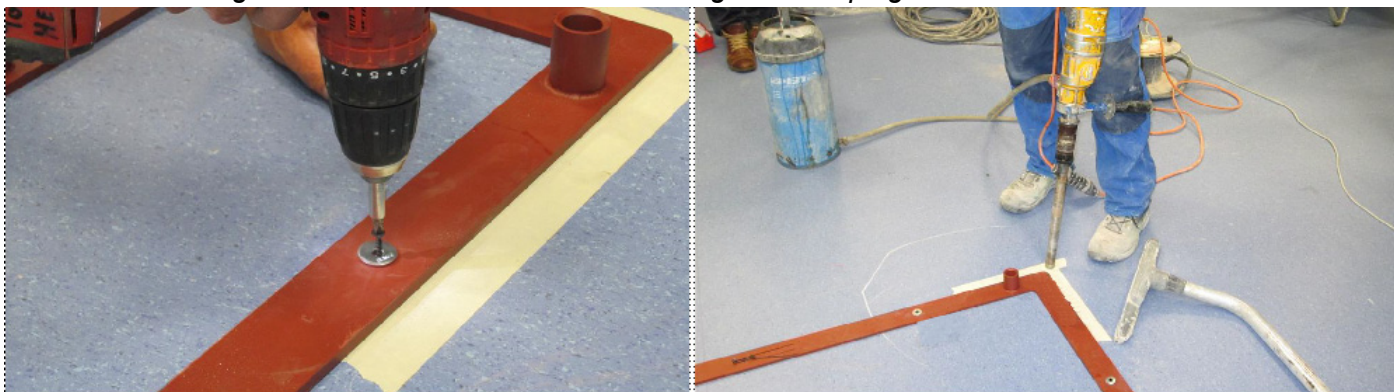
Left: Connect drilling jig to floor. Right: Prepare to drill anchor holes.
